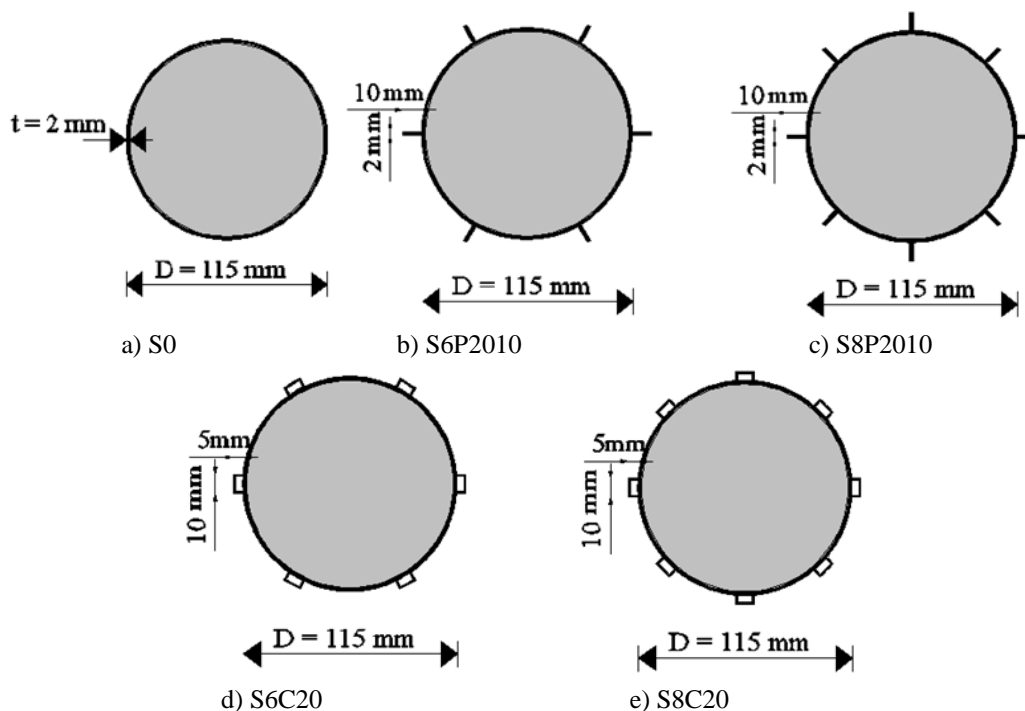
The cross section of specimens and the arrangement of stiffeners on perimeter column
